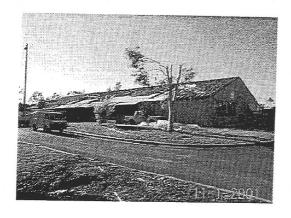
Complete damage to TAFE College building roof cladding (Myall St)
